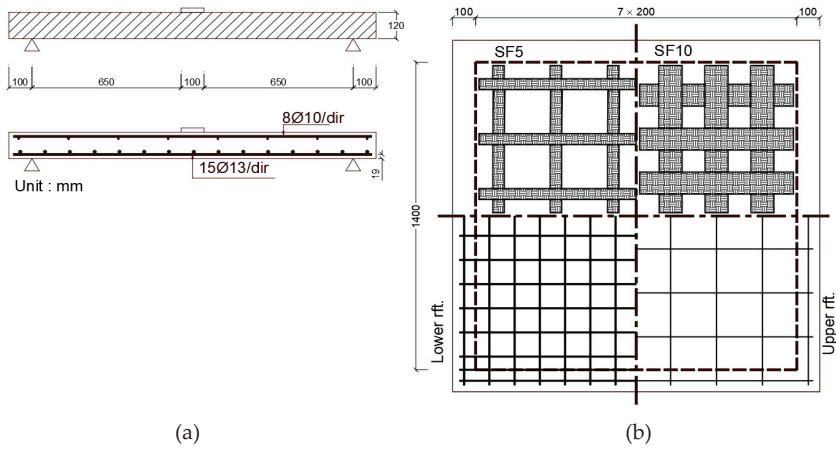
CFRP strips with different widths applied to the tension side of the slab, (a) two-way specimen cross section, (b) top and bottom reinforcement and two CFRP strip widths tested [33].
